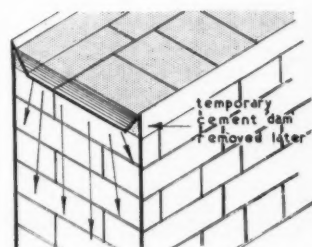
Above, method of treating a wall with fungicide when the top of the wall is accessible.
